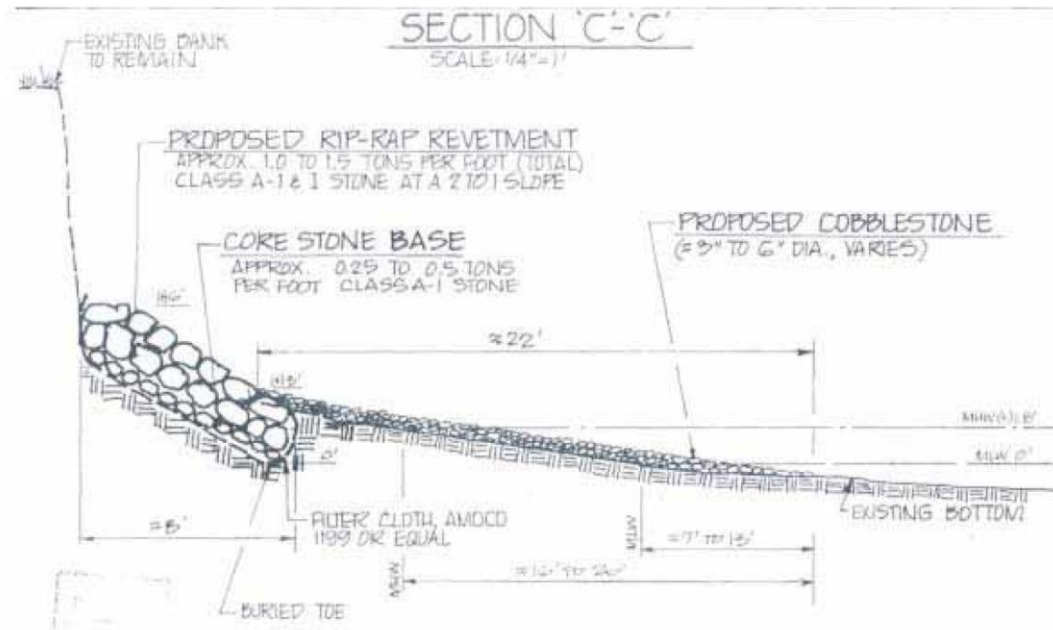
Typical cross-sections for sill built at Hull Springs Farm. Section locations are shown on Figure 1. Permit drawings by Bayshore Design, LLC.
